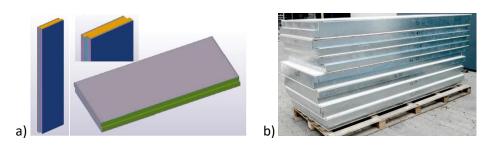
Modified CSIP composite panel reinforced with steel sheet claddings and edge profiles: a) computer model, b) prototype
